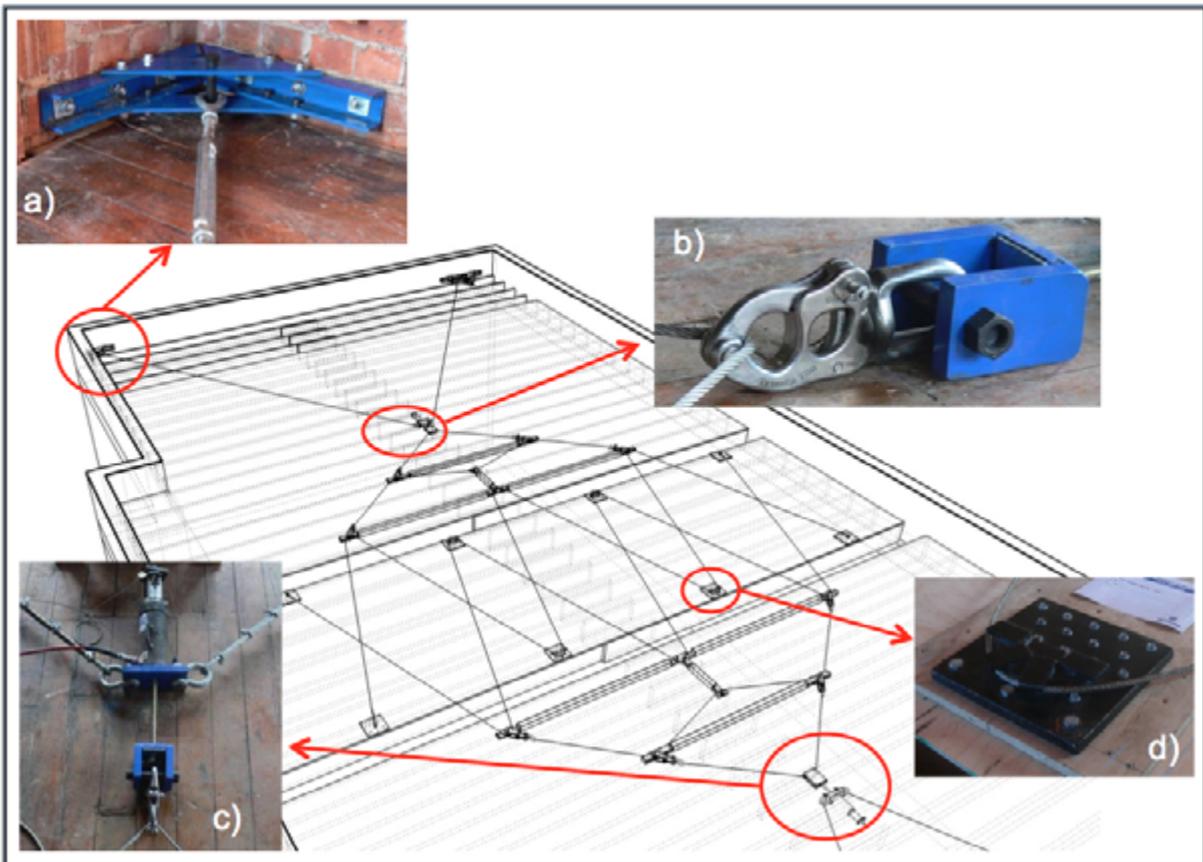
Details: a) wall connection bracket; b) snap shackle for instantaneous load-release; c) hydraulic actuator; d) central loading plate
